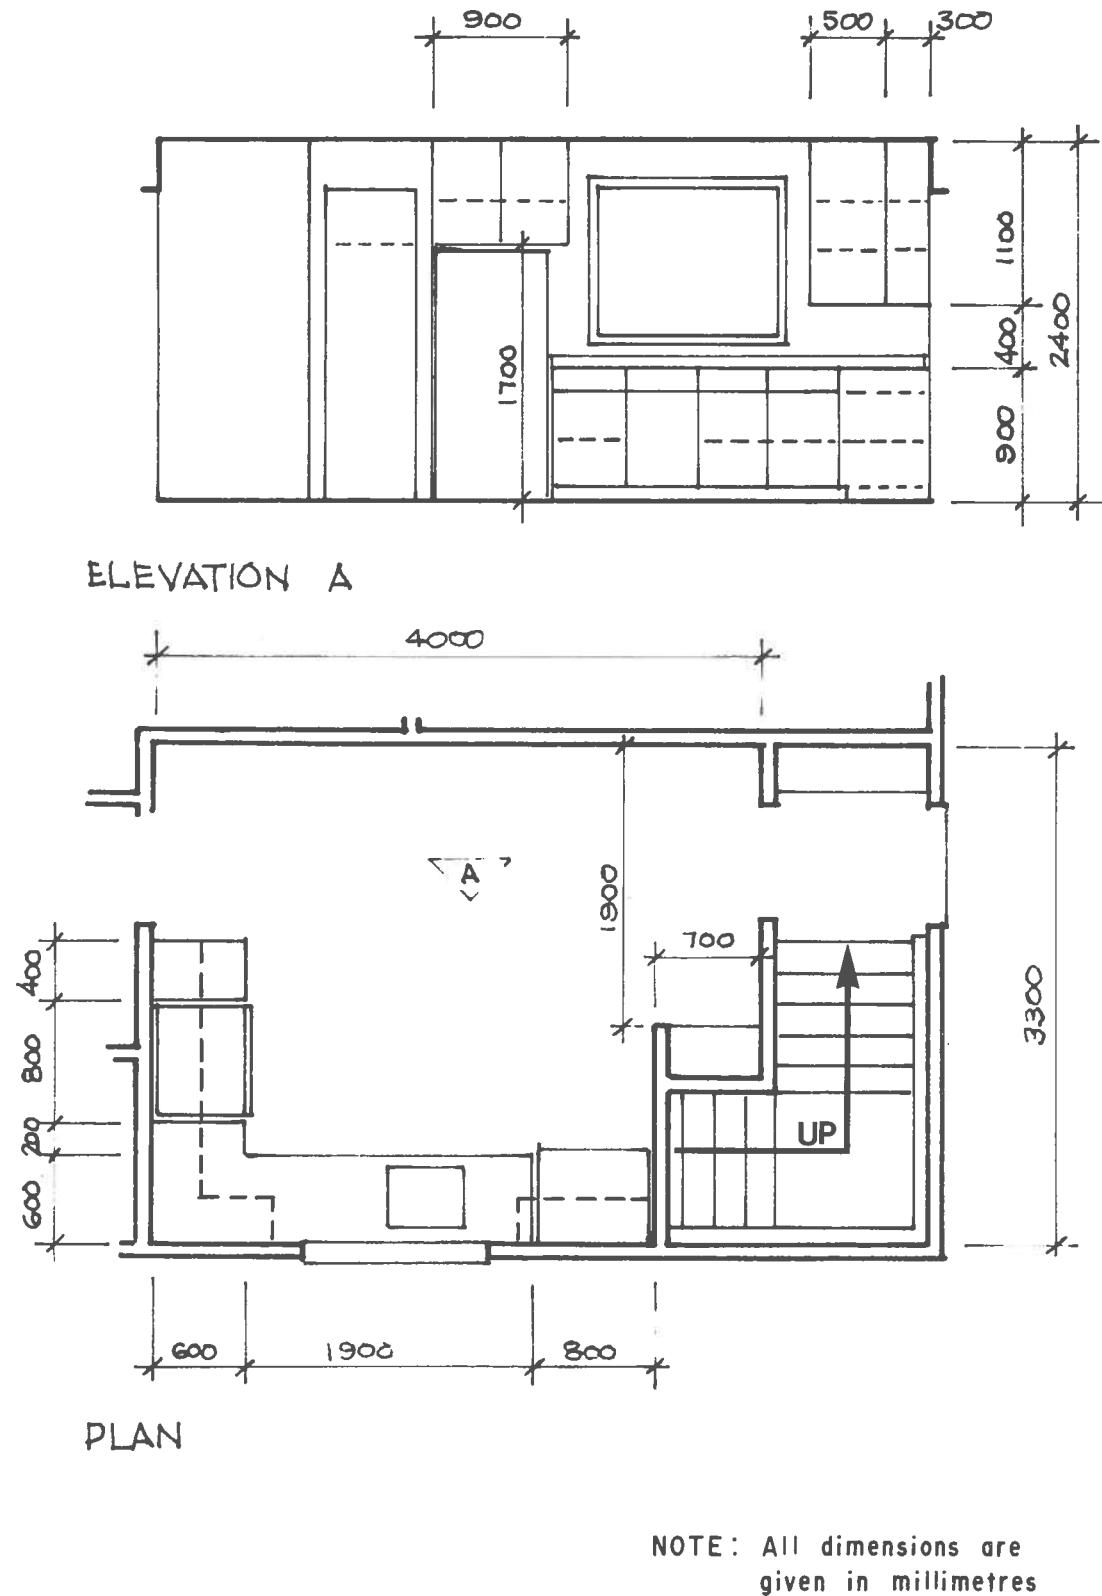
EXAMPLE OF DETAILED PLAN & ELEVATION 1:50
